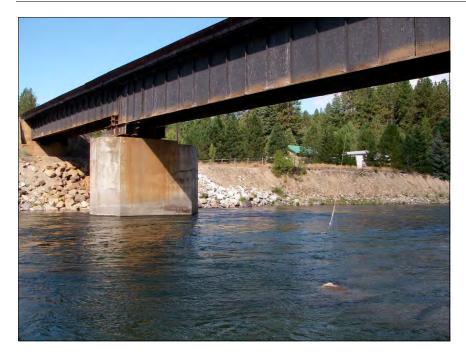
View looking upstream towards the right bank terrace, riprap armoring, and Burlington Northern Railroad Bridge at RM 41.9 (August 2011).
